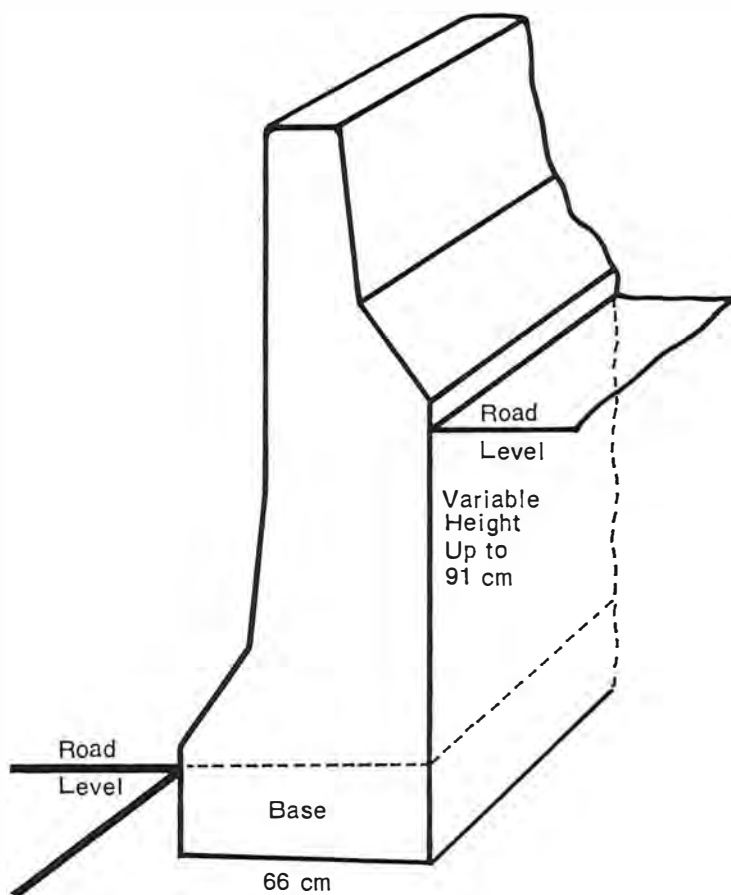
Profile of modified New Jersey type barrier wall designed for use where levels of roadway on each side of barrier wall are at different heights.
